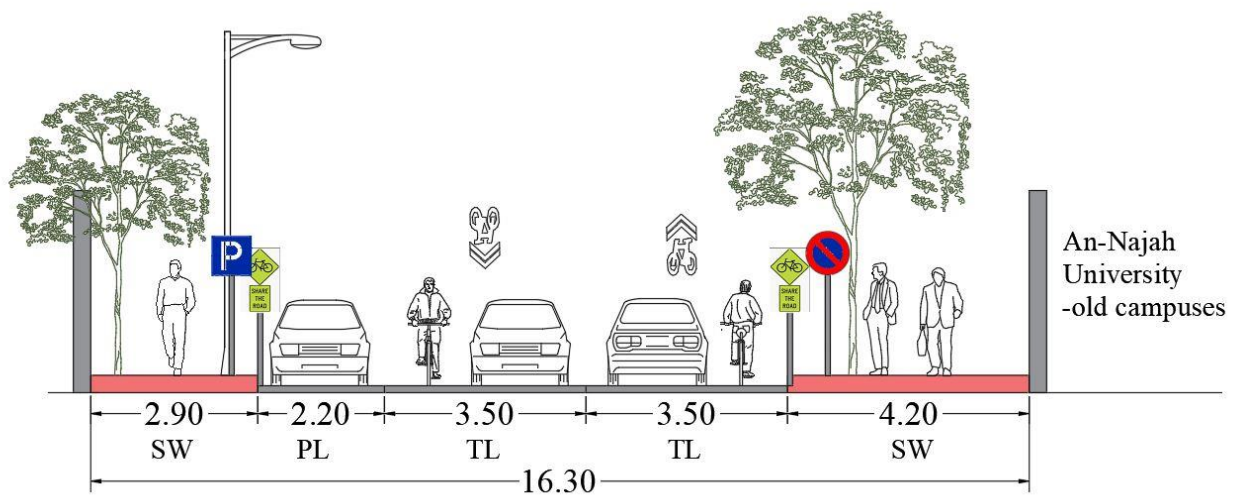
13: Typical Cross Section D-D, Omar Ibn Al-Khattab Street, An-Najah Old Campus
